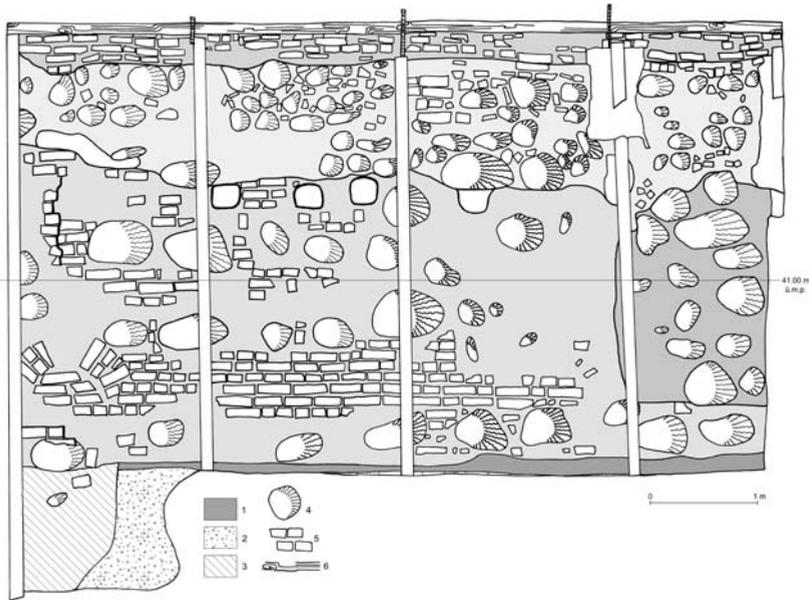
The southeastern wall of room 1 of medieval building I. Symbols: 1–black soil layer, 2–grey natural gravel, 3 – a pit , 4 – granite, 5 – brick, 6 – wood. Kristel Külljastinen.
